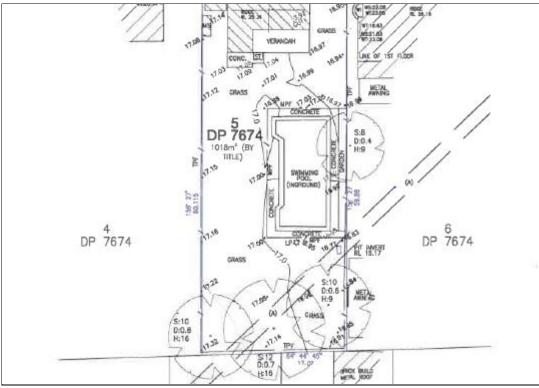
Extract from levels & detail survey showing easement for drainage traversing site
